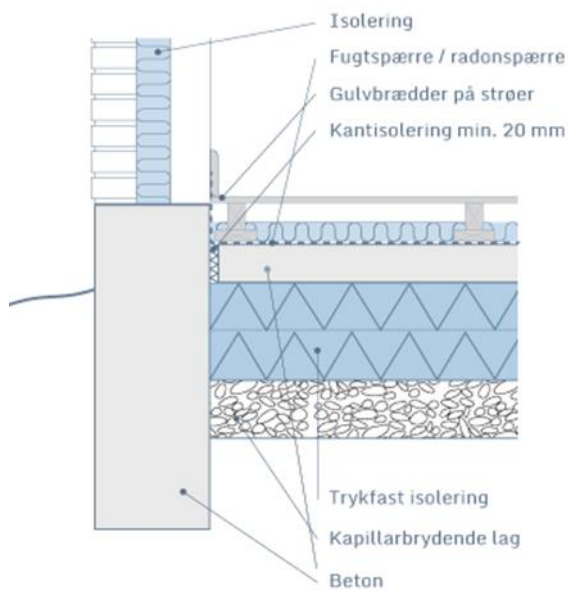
Schematic drawing indicating floor on the ground after insulation.
